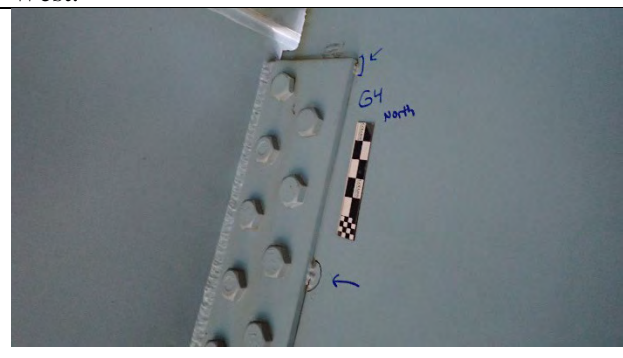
Typical Condition of the Exterior of Pier 6 at the West Web Plate, Looking North.
